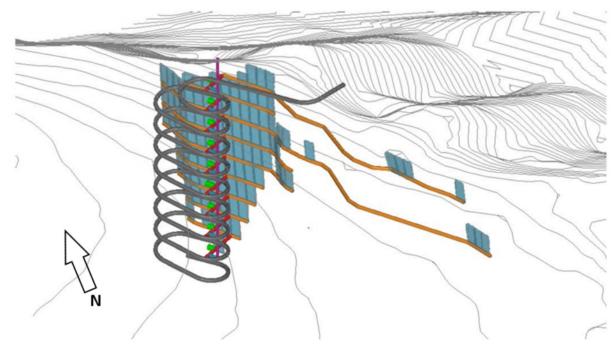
Vertikalny Underground Zone 4 Isometric View
